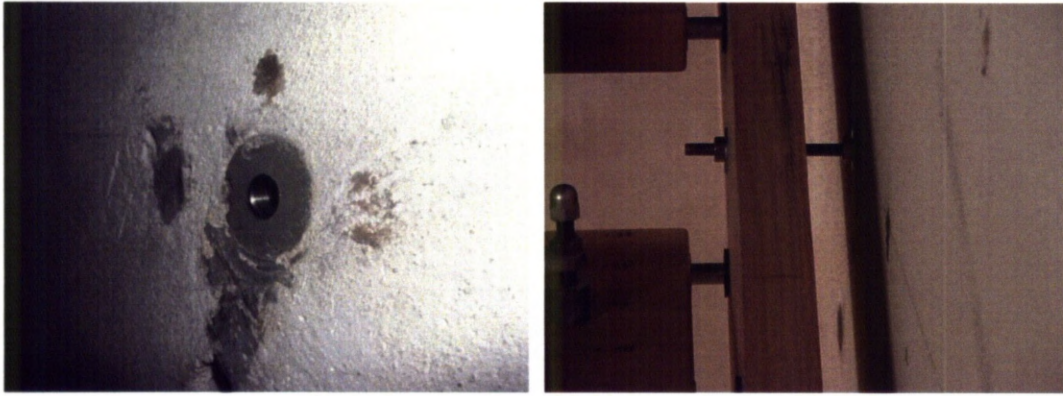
Left: Wall plug after installation; Right: Main set-up with 5 cm distance between string board and wall
